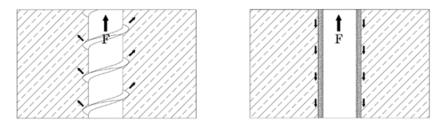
Load transfer mechanism of concrete screws (left) and bonded anchors (right) based on the approach of [5].
